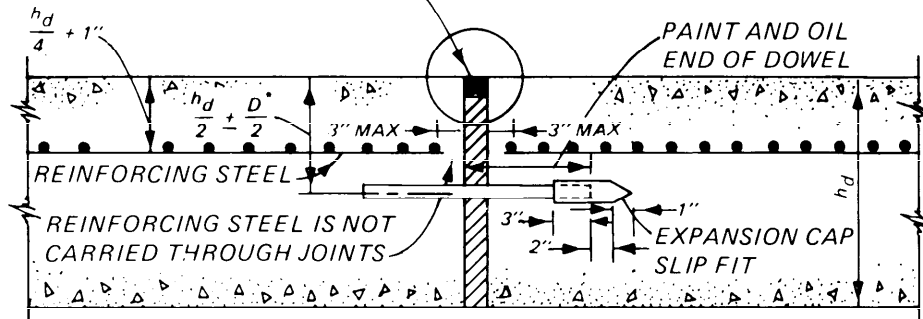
Construction joints for reinforced concrete pavements. (Sheet 4 of 4)
